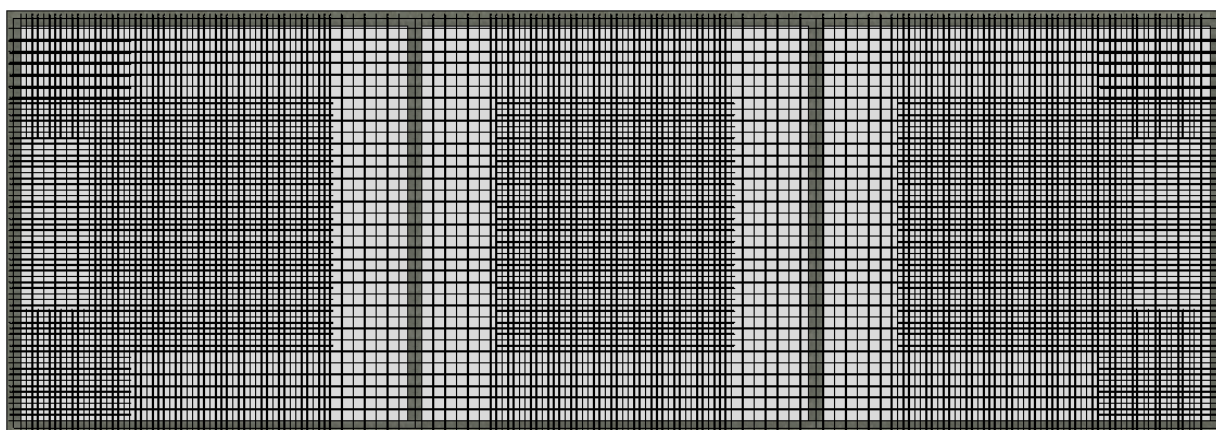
Lower surface reinforcement for panels A, B and C
